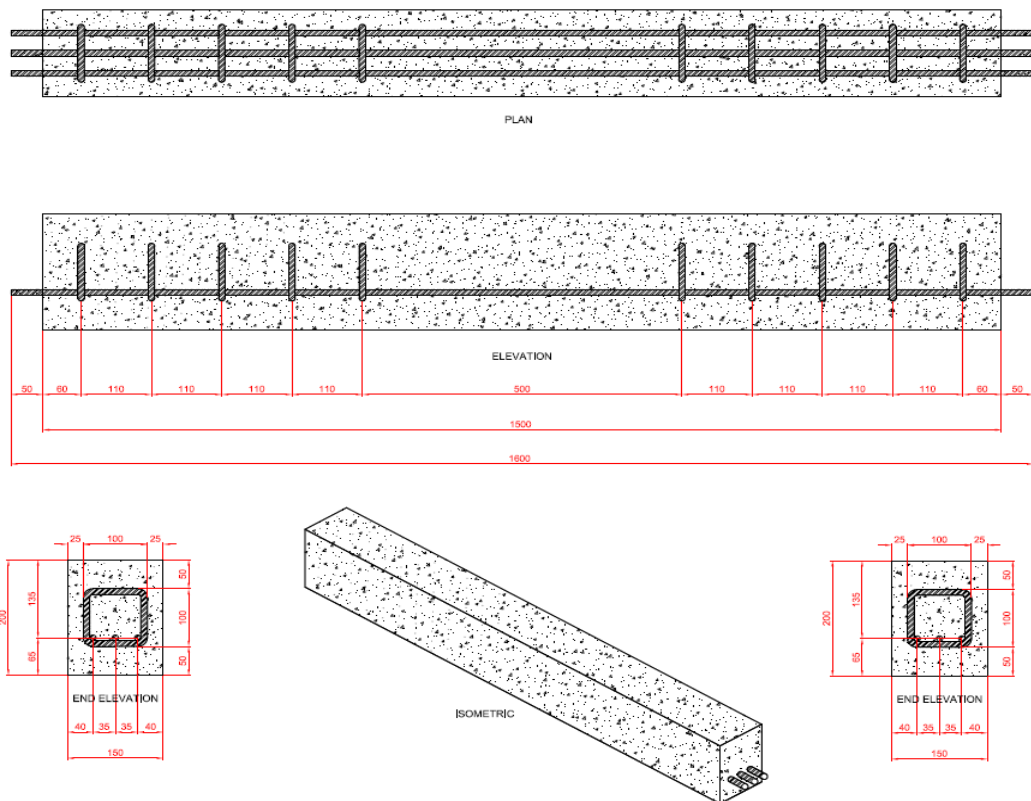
BEAM SET A DETAILS (ROBINSON, 2013)
